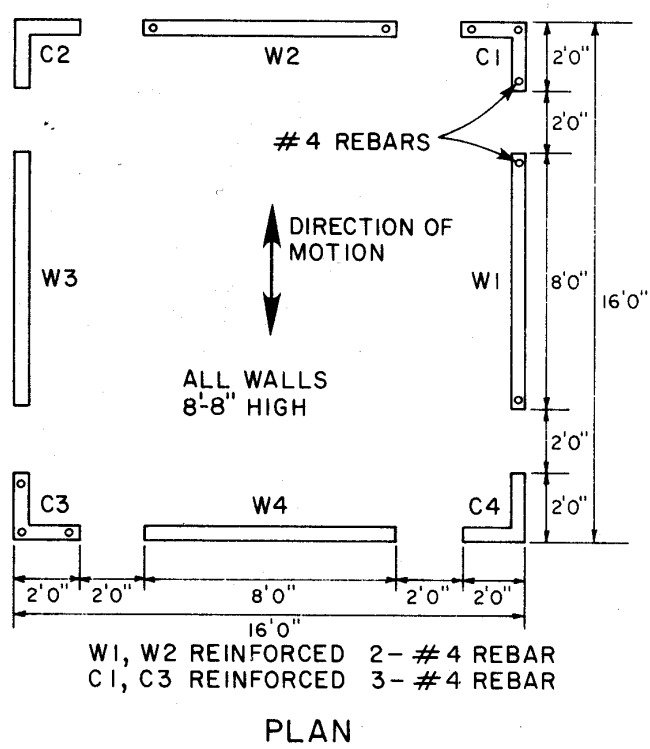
Specimen House 1 in Clough's test (Clough et al. 1979)
